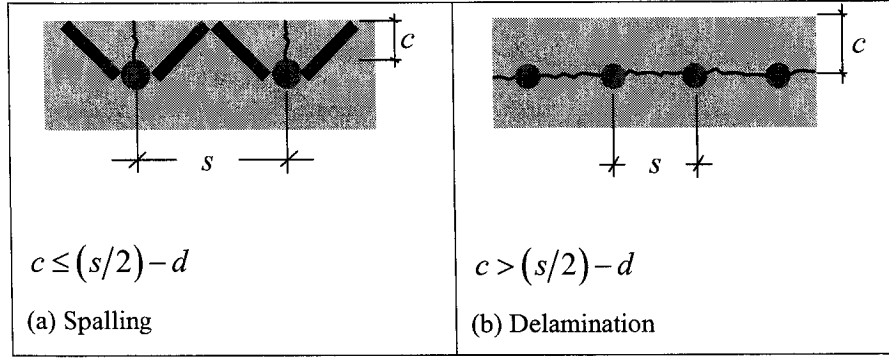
Corrosion-induced failure patterns of concrete bridge decks
